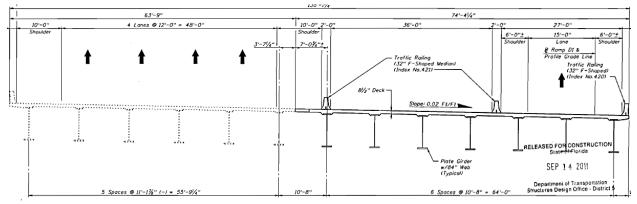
Cross-section of the bridge SR-589 over Hillsborough Avenue
